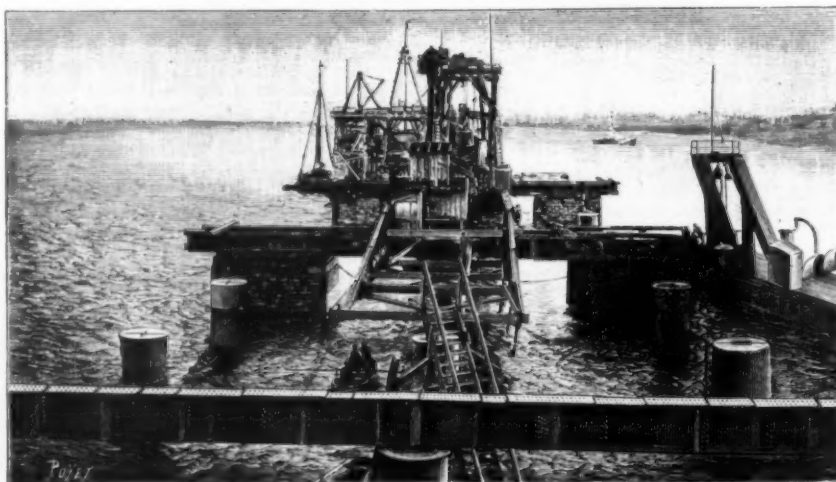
THE WORK OF DRIVING THE TUBES.
